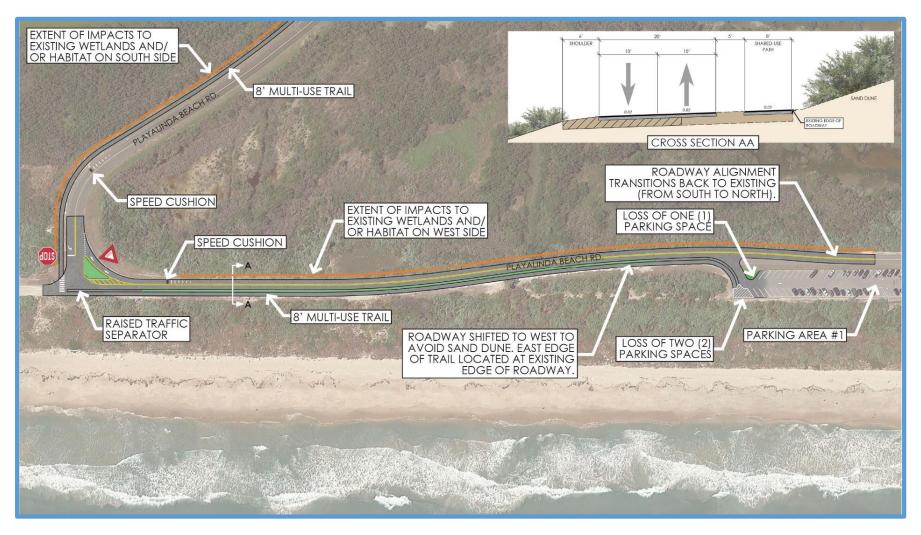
E-W CANA Alternatives 1B and 2B: Section from Patrol Road to Parking Area No. 1
